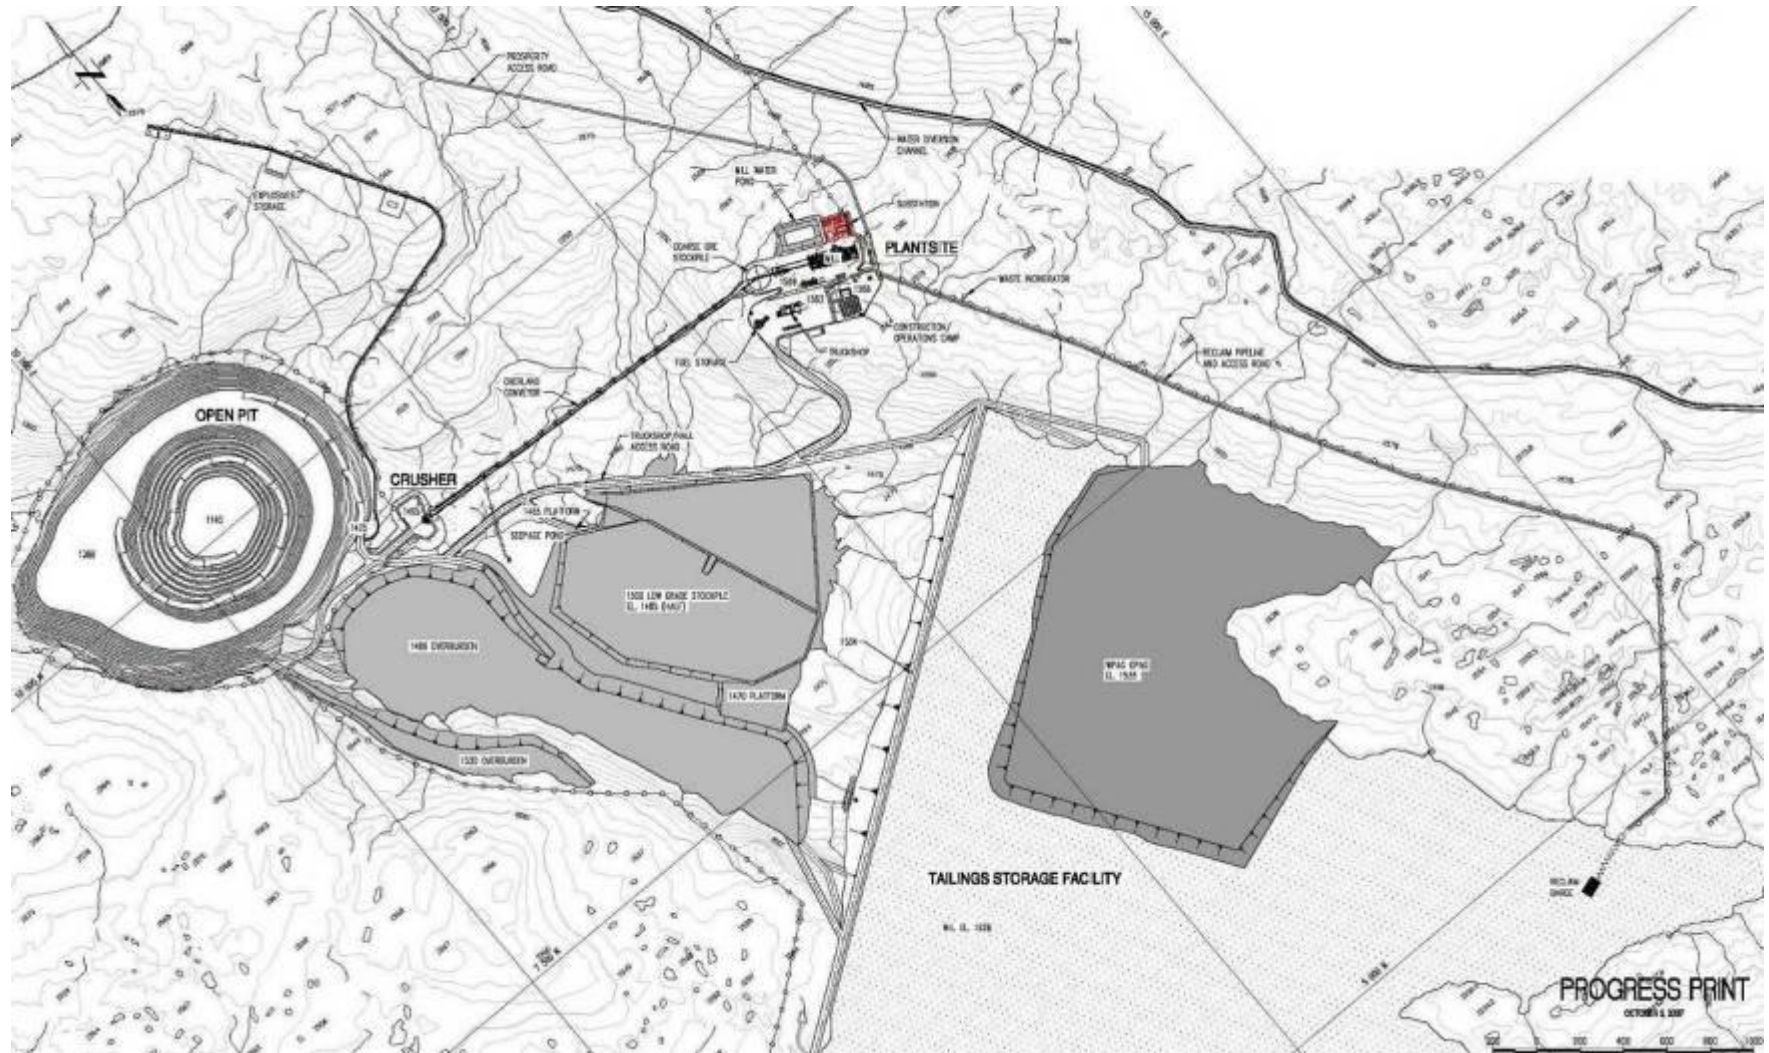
Pit and Stockpiles Plan—End of Year 8
